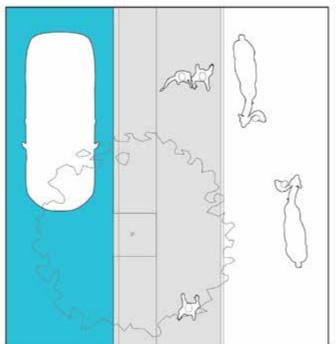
Bridle Path alongside a Sidewalk/Parkway on a Local Street.
